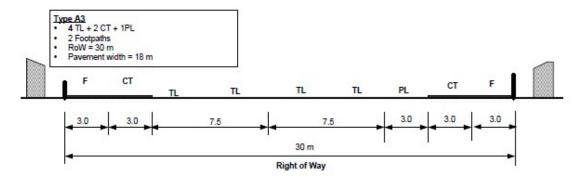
Typical cross section of sub Arterial (Feeder Roads)
